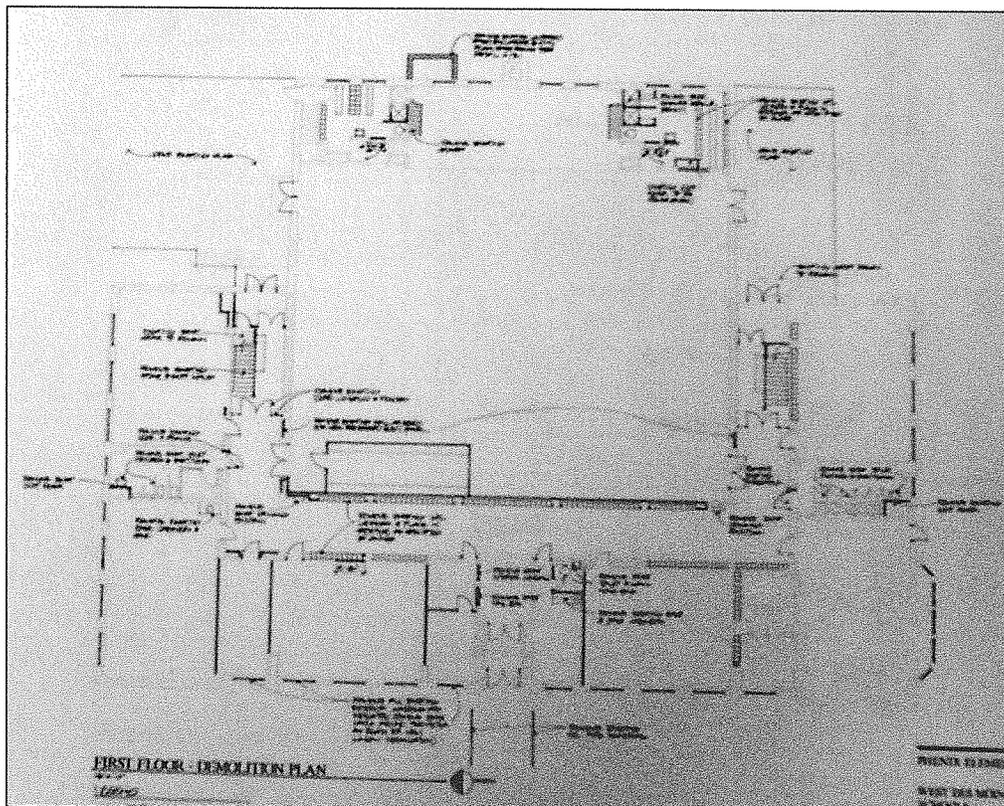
First floor demolition plan, 1992 (1992 remodeling plans)
